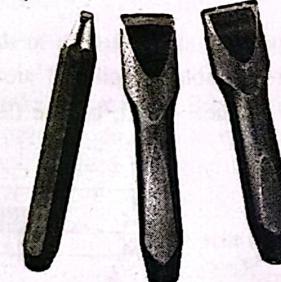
(b) Pointed Chisel, Tracer, Pitching tool.
